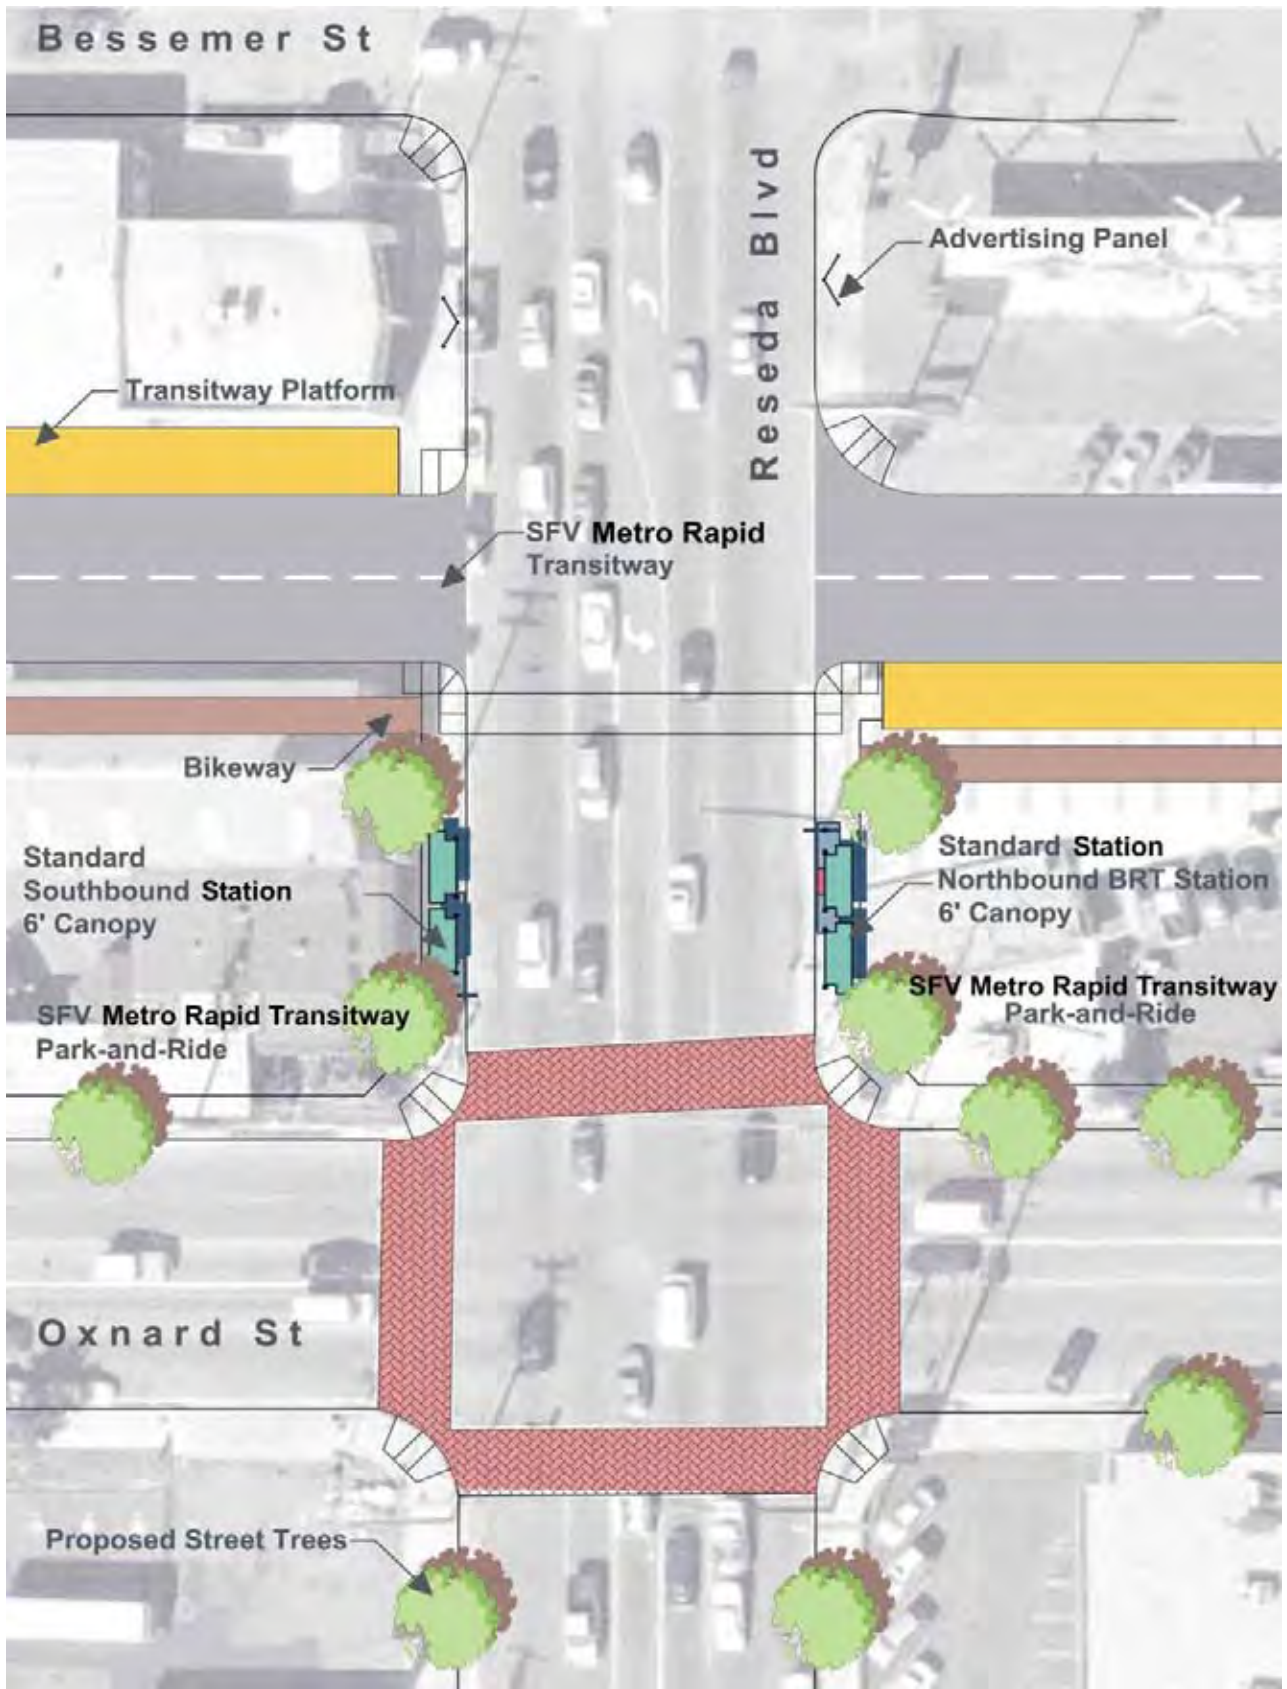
and 4-30 are site plans for the East-West Metro Rapid Transitway and Sherman Way stations, respectively. Figure 4-31 is an artist rendering of the Sherman Way station, showing station area improvement such as canopies, curb pop-outs, special paving, and landscaping, as well as the potential for constructing a landscaped median along Reseda Boulevard to improve traffic operations and the appearance of the street.
